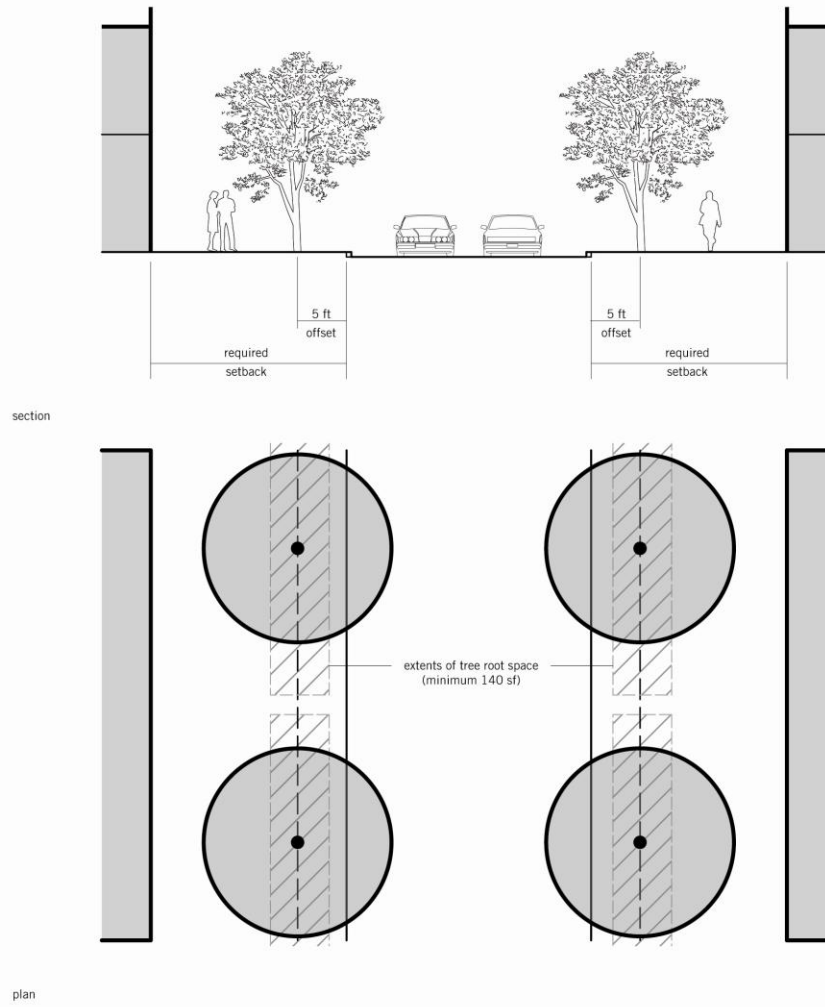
District Framework Plan - Streetscape Scenario with FDOT requirements
